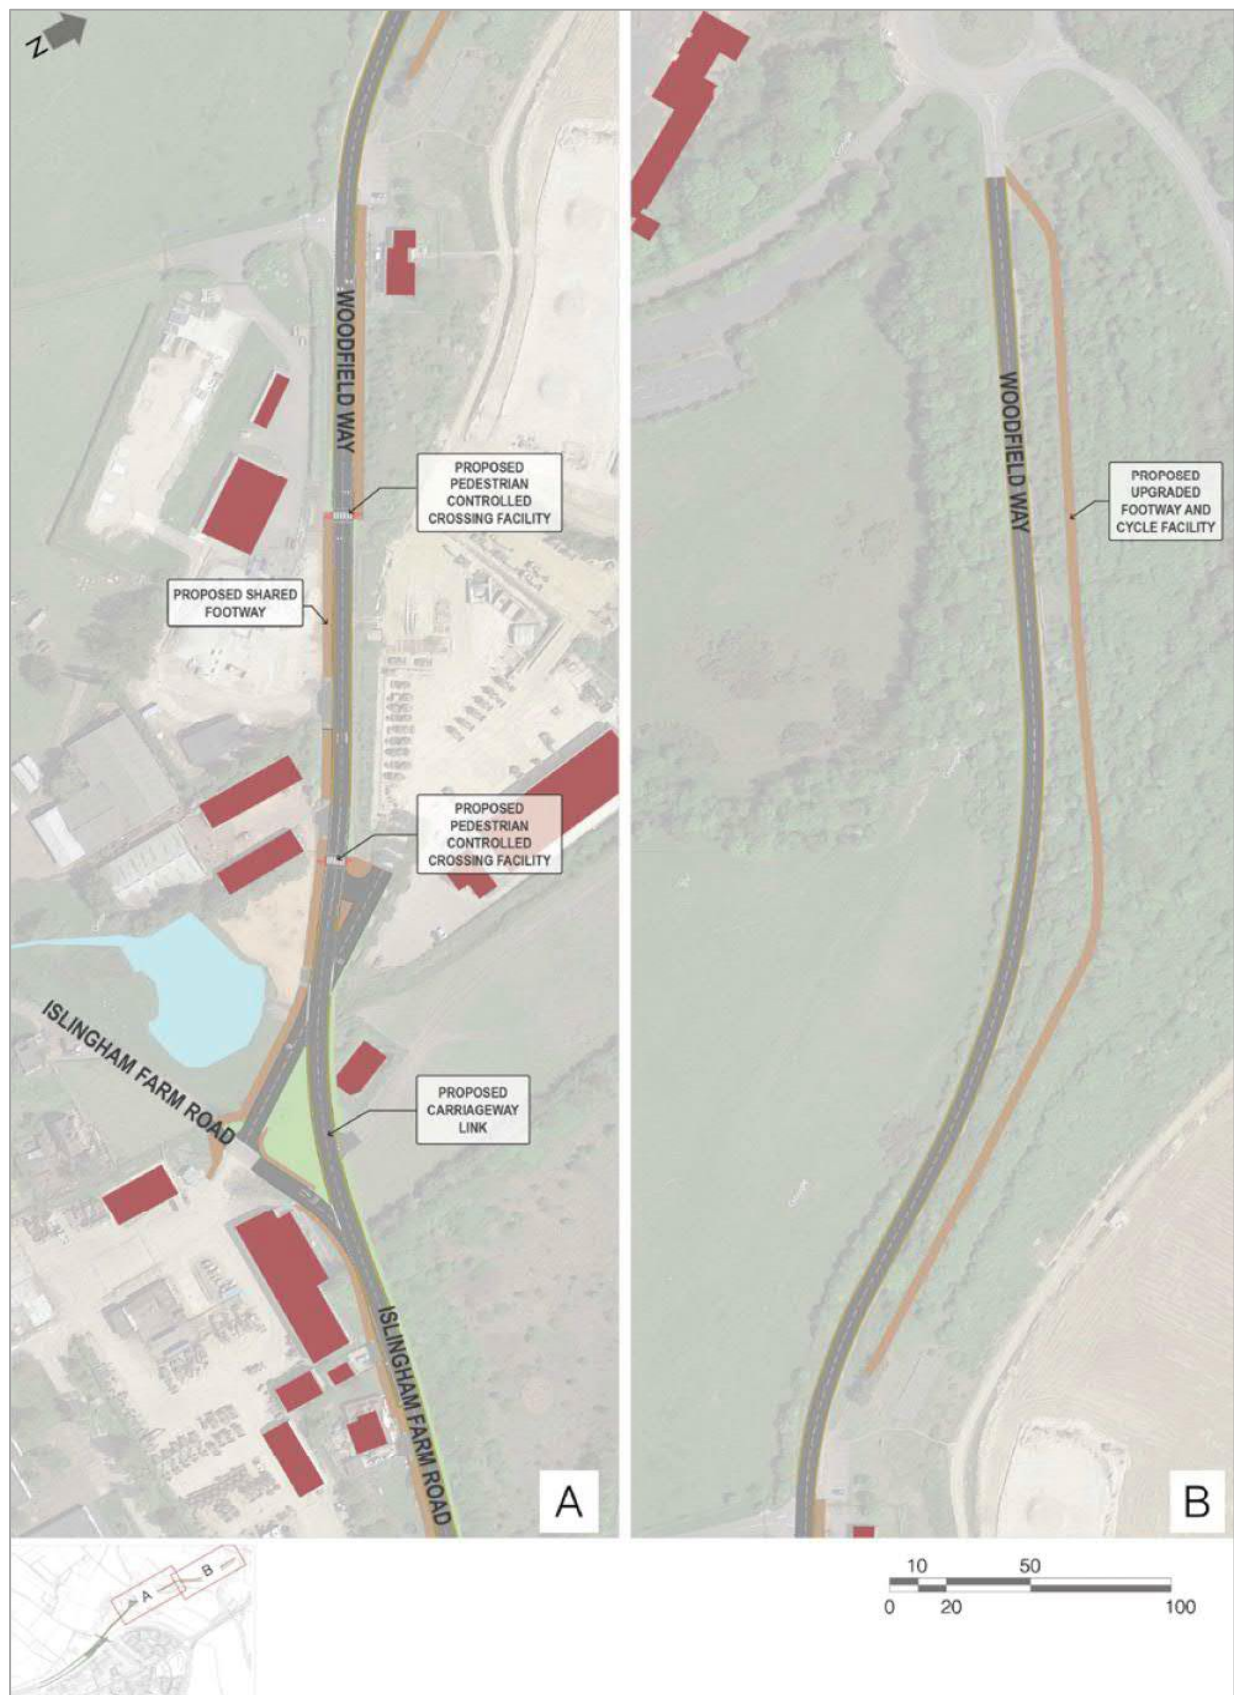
View A shows the widening of Islington Farm Road, realigned with Woodfield Way to provide improved traffic flow. View B shows the improvements along the existing Woodfield Way including the provision of several crossing points, and an adjacent shared footway cycleway facility.
